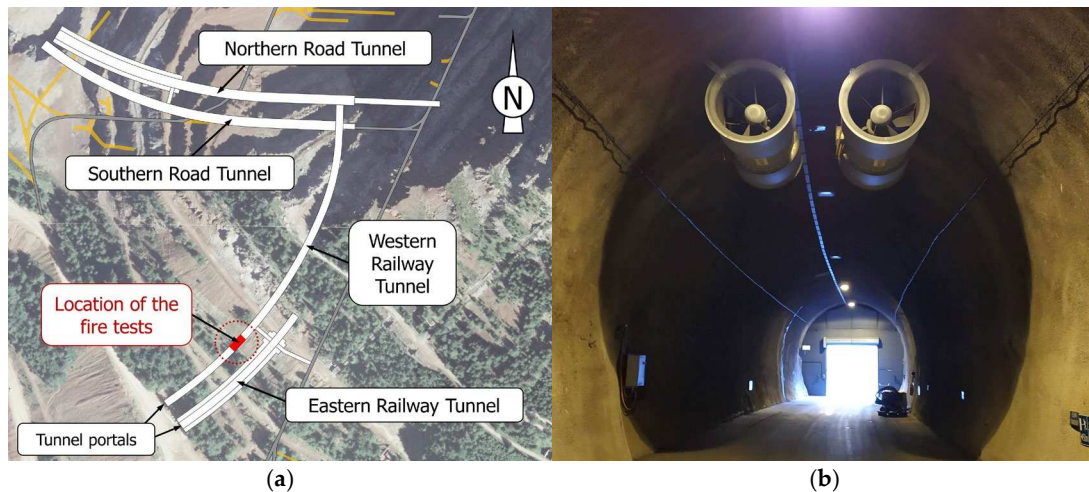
Zentrum am Berg underground research facility: (a) tunnel system layout; (b) interior view of the Western Railway Tunnel towards the portal.
